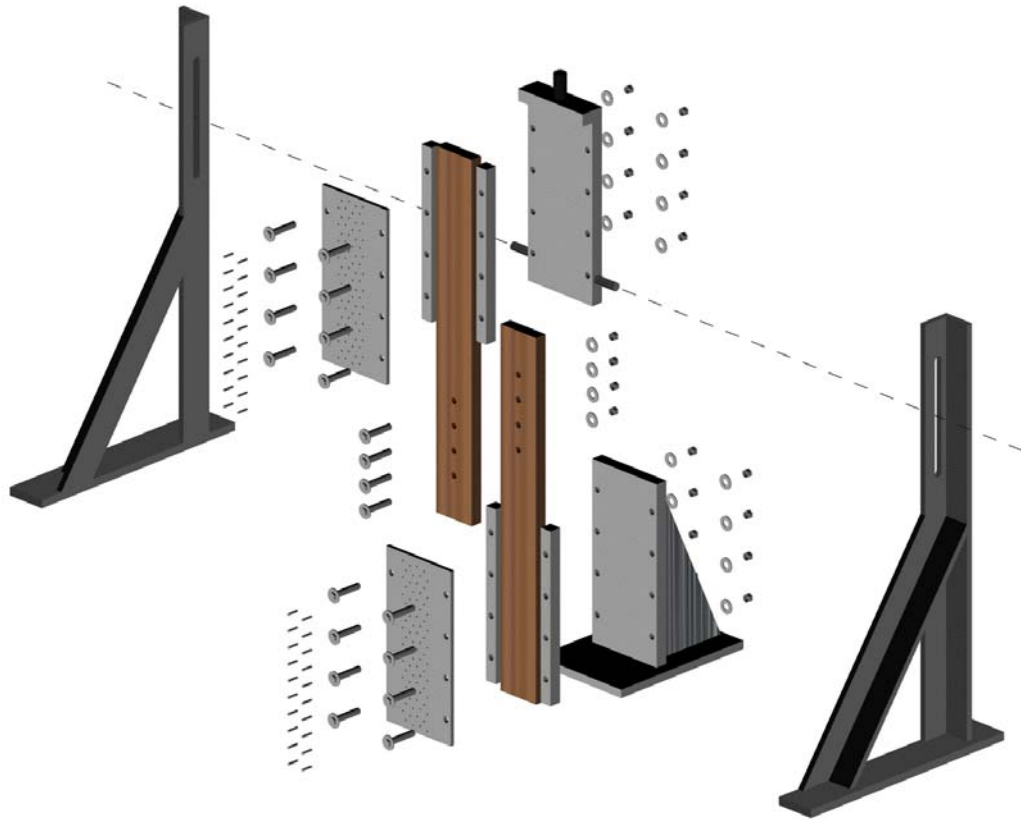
Rendering of joint to test fixture assembly (from Heine, 2001).
